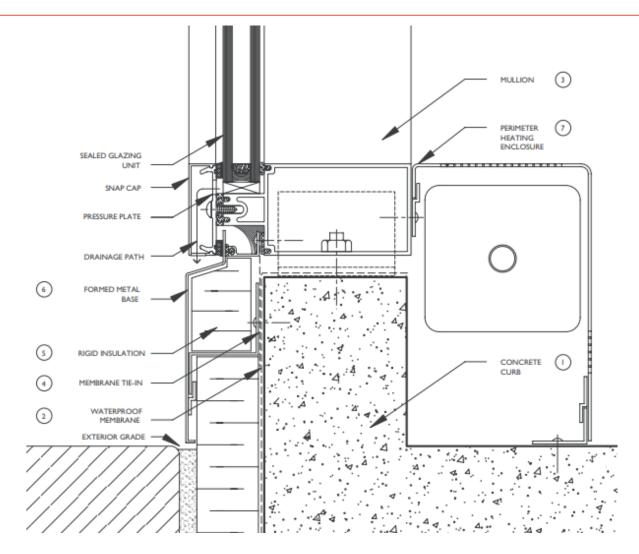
CURTAIN WALL SECTION WITH FIXED PERIMETER HEATING. IMAGE SOURCE: [73]
